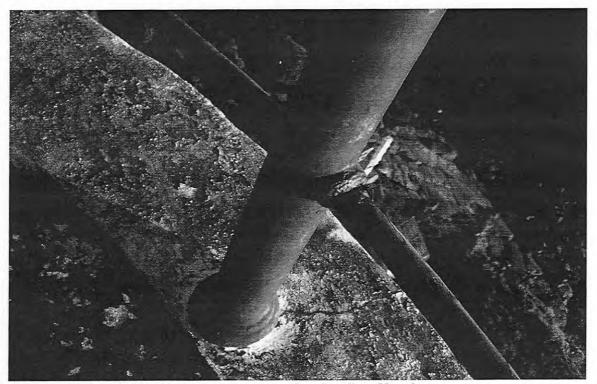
Interior of Lamphouse showing deteriorated concrete.
